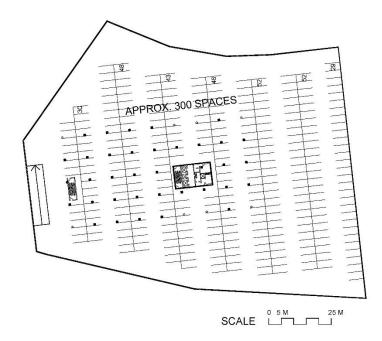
Option 3B – Market Available New Construction Potential Concept Layout
